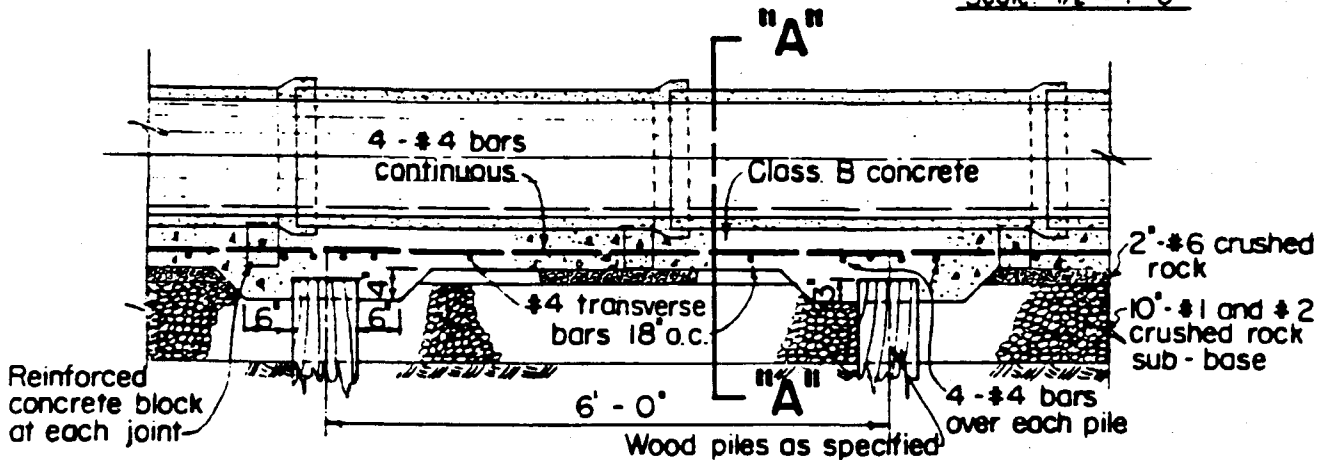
DETAIL OF CONCRETE JACKET FOR PIPES 12" AND SMALLER
